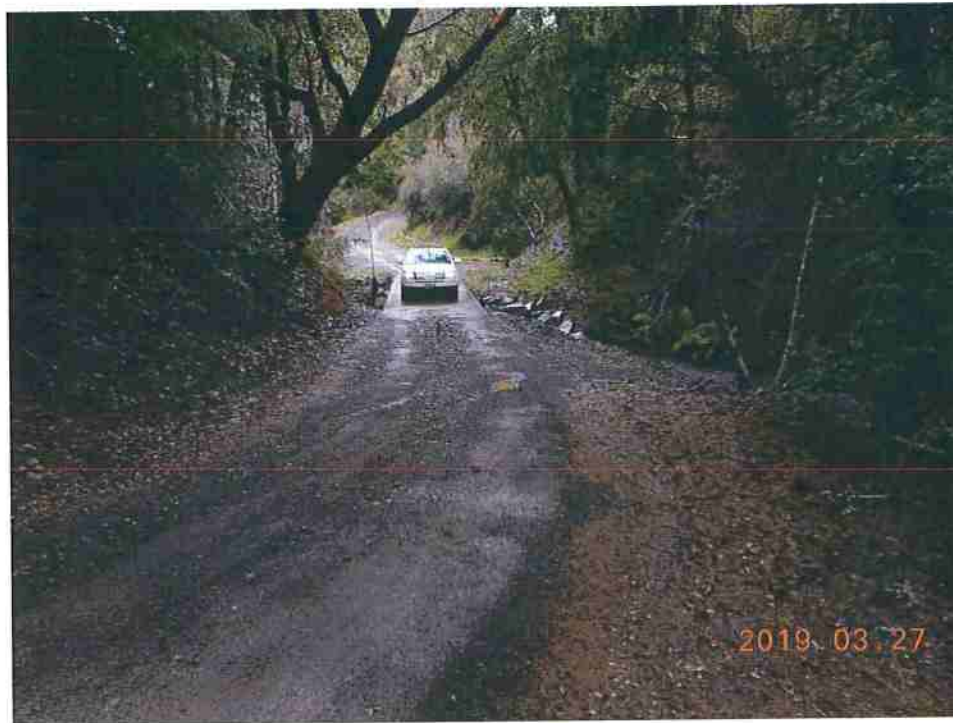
RP 10. Traveling South-East. Photo taken facing North-West.
